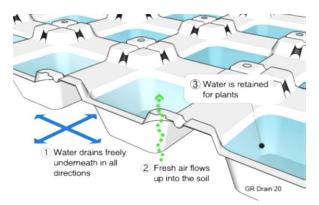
Water Retaining and Drainage Process in Green Roof Systems (Hui, 2011).
